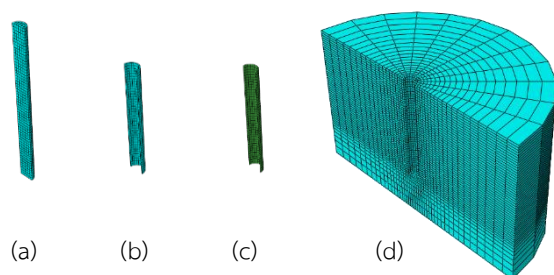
Typical of adhesive anchor model (a) anchor (b) adhesive (c) concrete/adhesive interface (d) concrete
